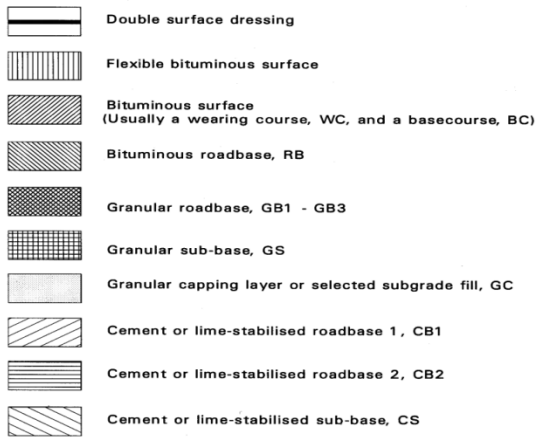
Components of flexible and rigid road pavement structures (Austroad, 2017).
